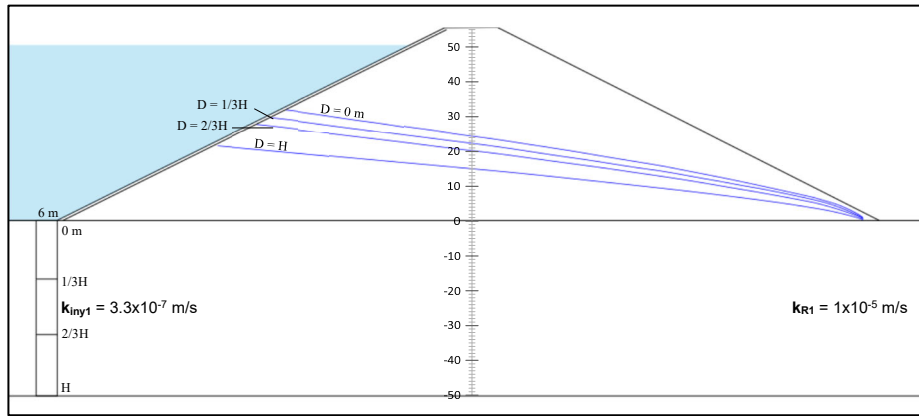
3-line grout curtain: Piezometric profile within the dam wall – $S_2 = 50$ m stratum.
